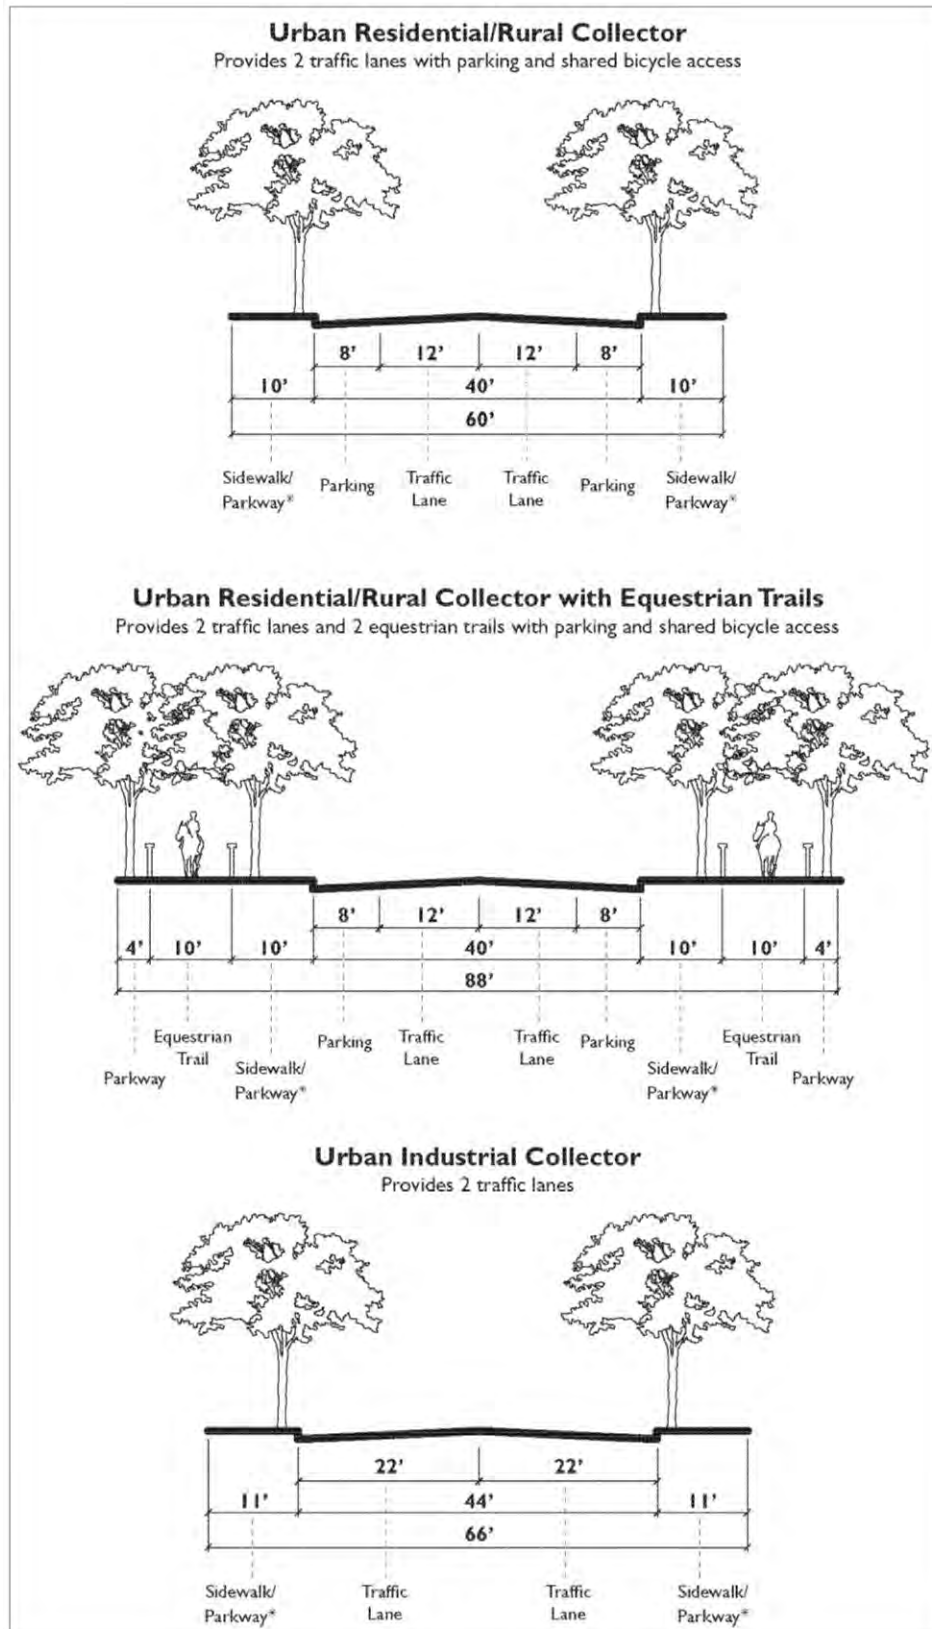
CITY OF CHINO GENERAL PLAN ROADWAY CROSS-SECTIONS (3 OF 3)
